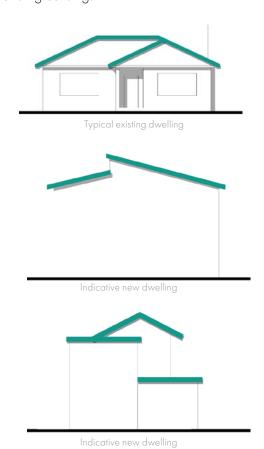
Demonstration of acceptable gable and pitched roof form designs.
